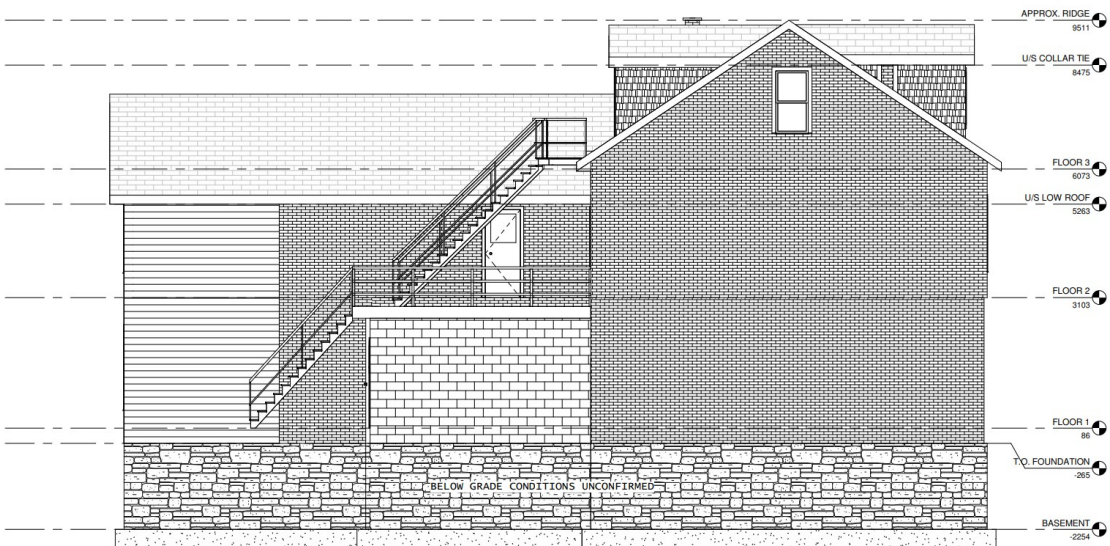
Drawing of 164 Bathurst Street, illustrating the building's south elevation, prepared by T. Smith Engineering, 2019. (City of Toronto Building Records.)
